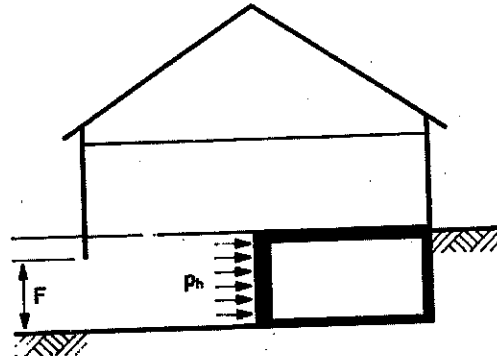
Air blast loads on exterior walls not in contact with the ground.
